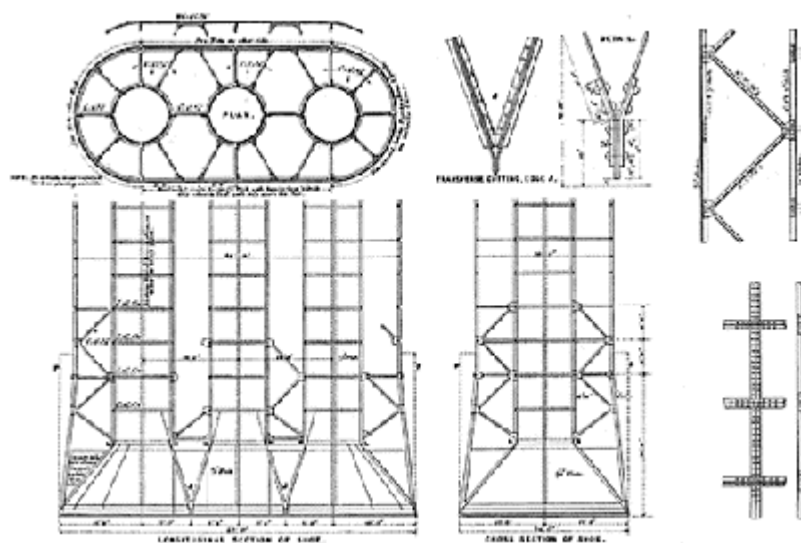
Plan and cross-section of caisson, shoe and details of cutting edge (Burge, 1890).
